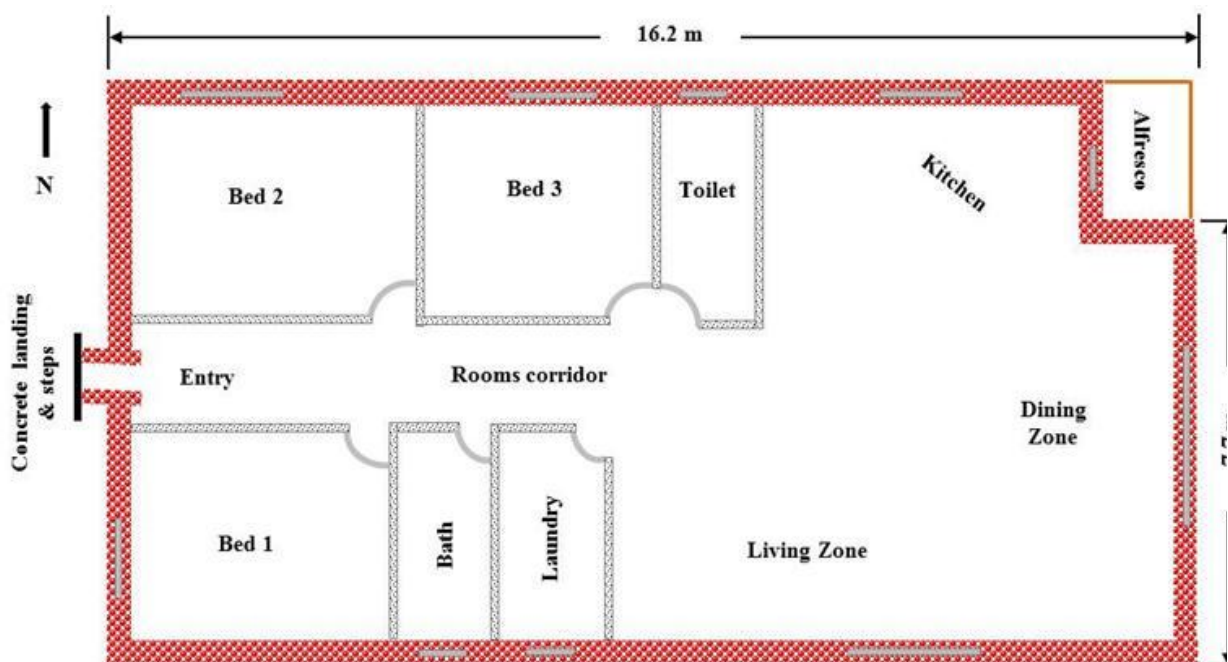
A plan view of typical residential 3 bedrooms house, (Aldawi et al., 2013)
